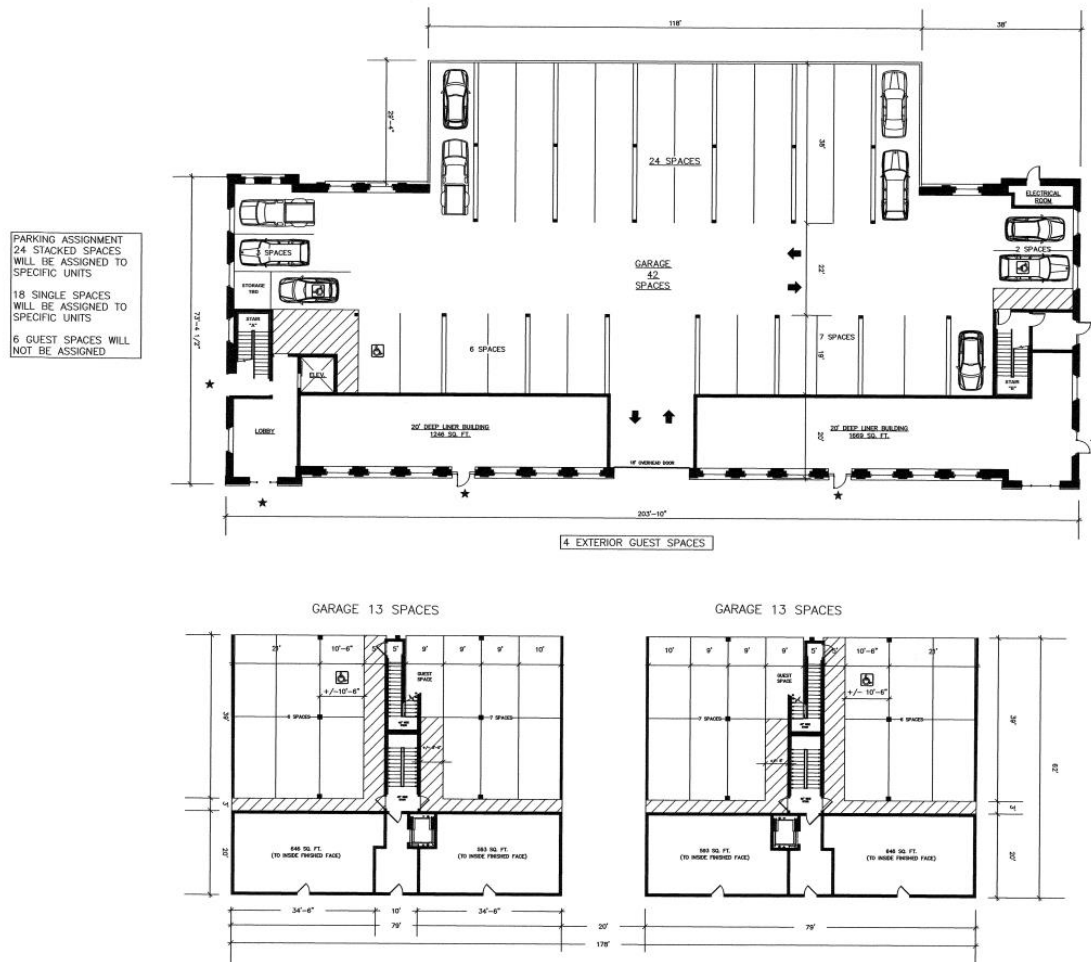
Proposed Parking Layout (72 Spaces) for the Design Review Plan
